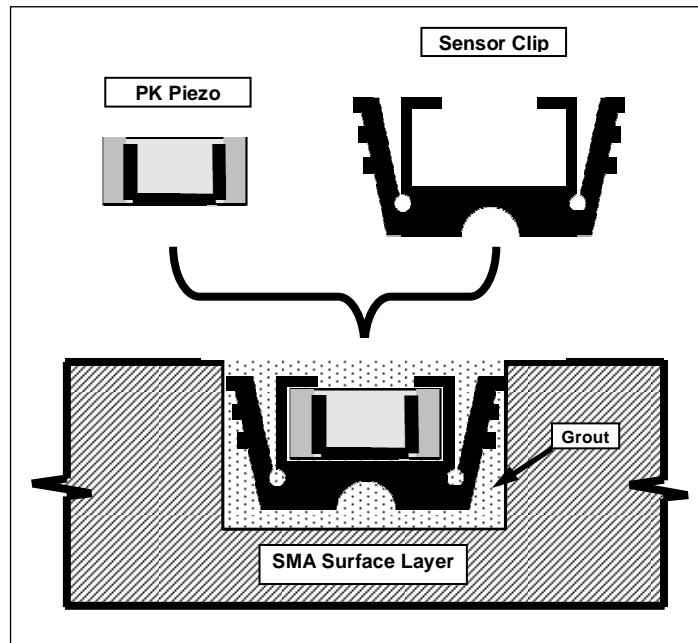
Cross section of the PK piezo strip used for the wheel wander grid showing how it is assembled in the pavement.
